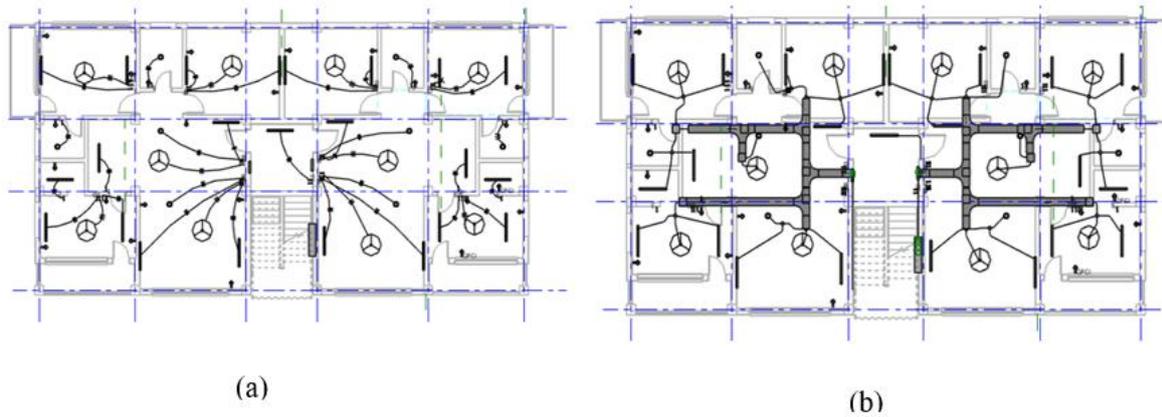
(a, b) Electrical Floor Plan & Ceiling Plan
